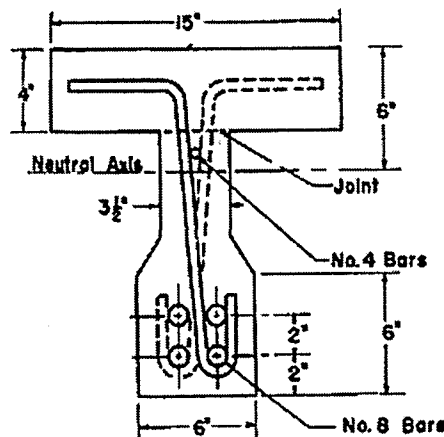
Cross-Section of Beam Tested by Saemann and Washa
